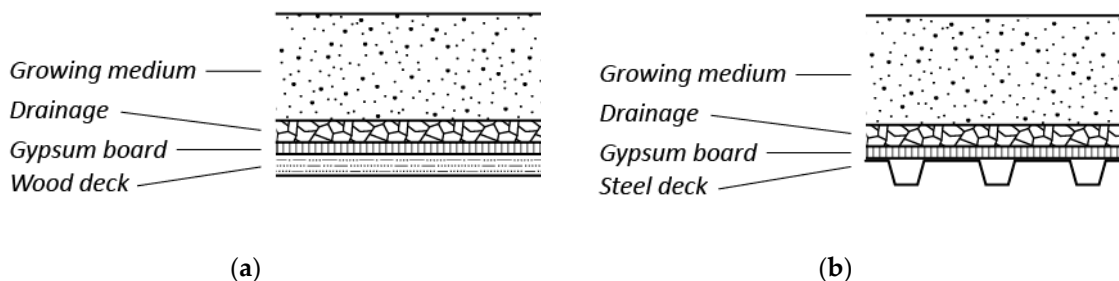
Assemblies with the gypsum board installed over a: (a) Wood deck; (b) steel deck.
